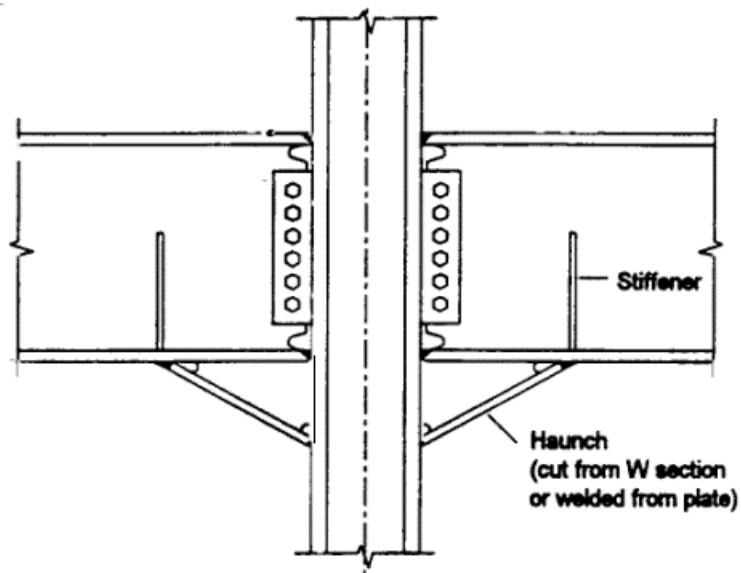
Welded Haunch Connection
